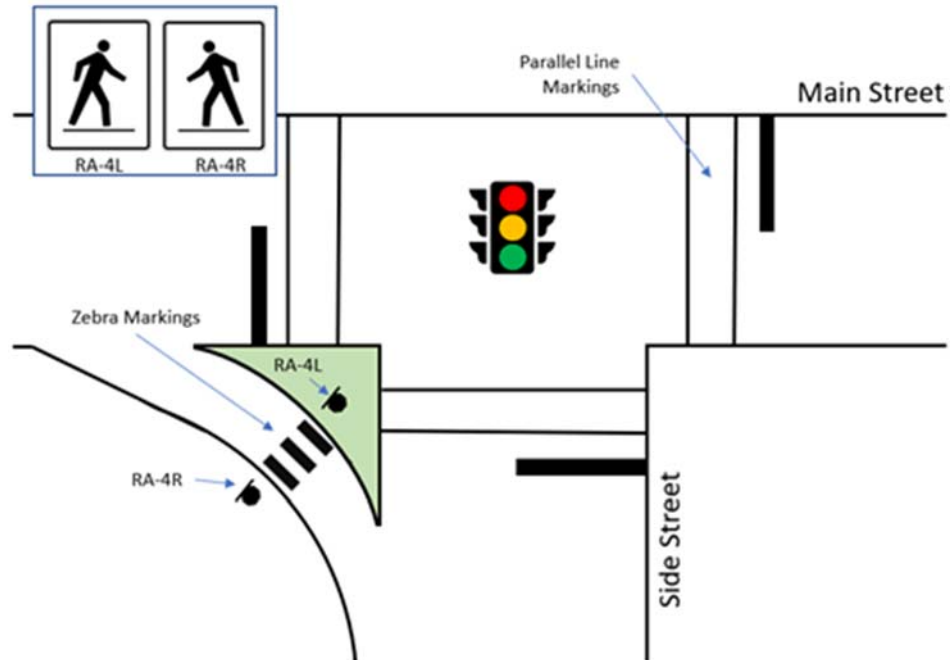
Typical Crosswalk Signage and Pavement Markings – Signalized Intersection
